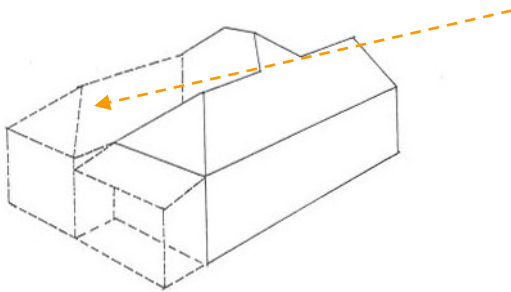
Multiple additions, which can be facilitated to rear or side elevation
